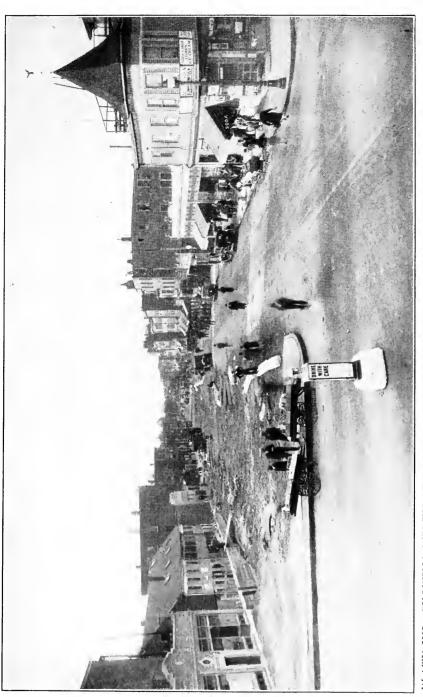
PLATE XII.—SHOWING WIDTH OF PORTER STREET BEFORE BUILDINGS WERE REMOVED AND THE WIDTH IT WILL BE AFTER THE WIDENING.
